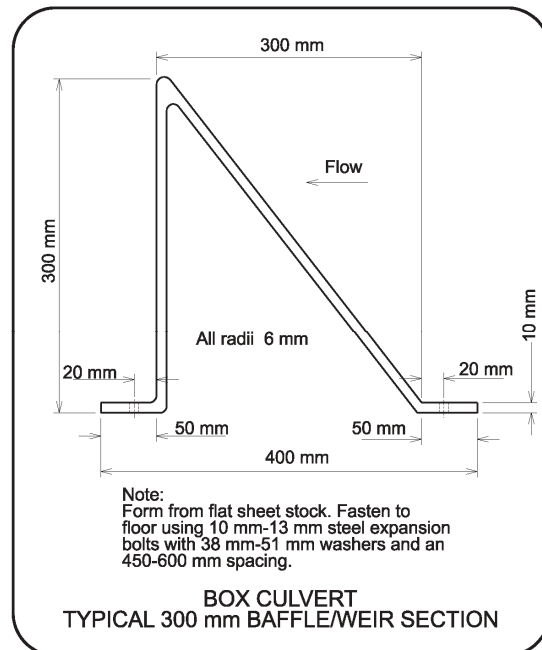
Section of standard 300 mm box culvert baffle/weir.
